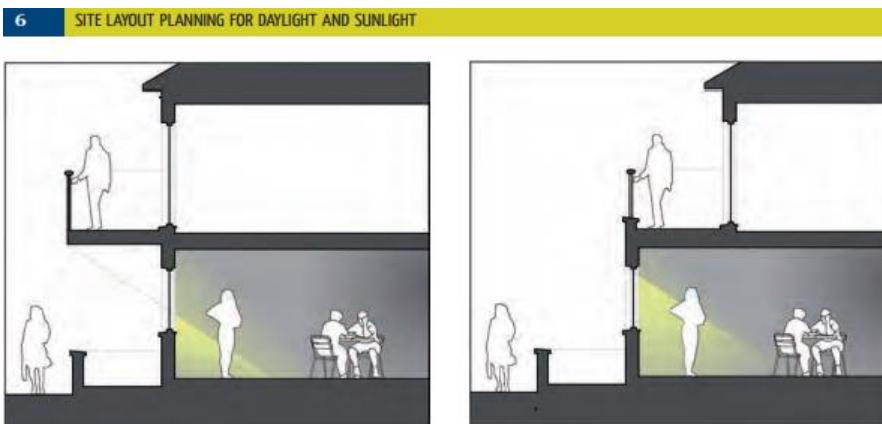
Balconies and projecting access ways can restrict daylight to rooms lit by windows below them
